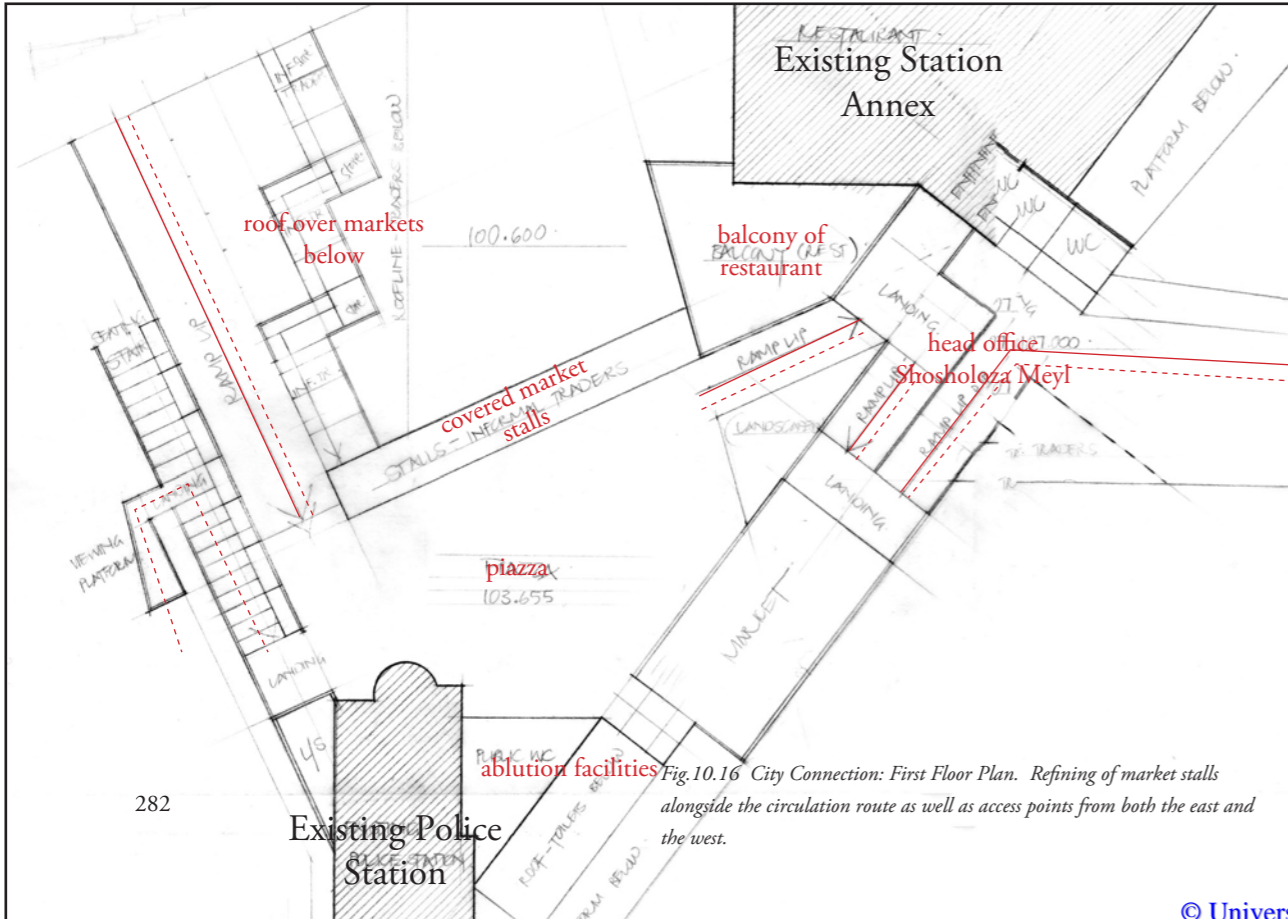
City Connection: First Floor Plan. Refining of market stalls alongside the circulation route as well as access points from both the east and the west.
